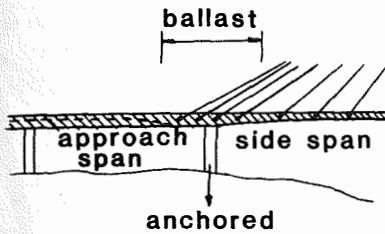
Girder continuity at anchor pier, from reference 2.
